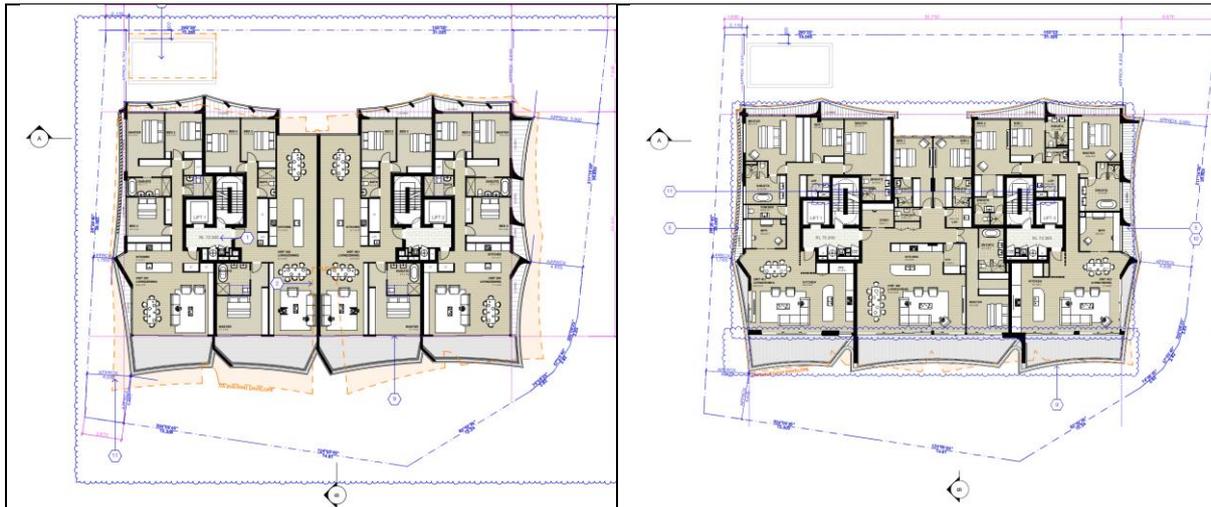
& 10 – Approved Level 2 Floor Plan, DA 2004 Rev C (left) and Proposed Level 2 Floor Plan, DA 2004 Rev F (right)
